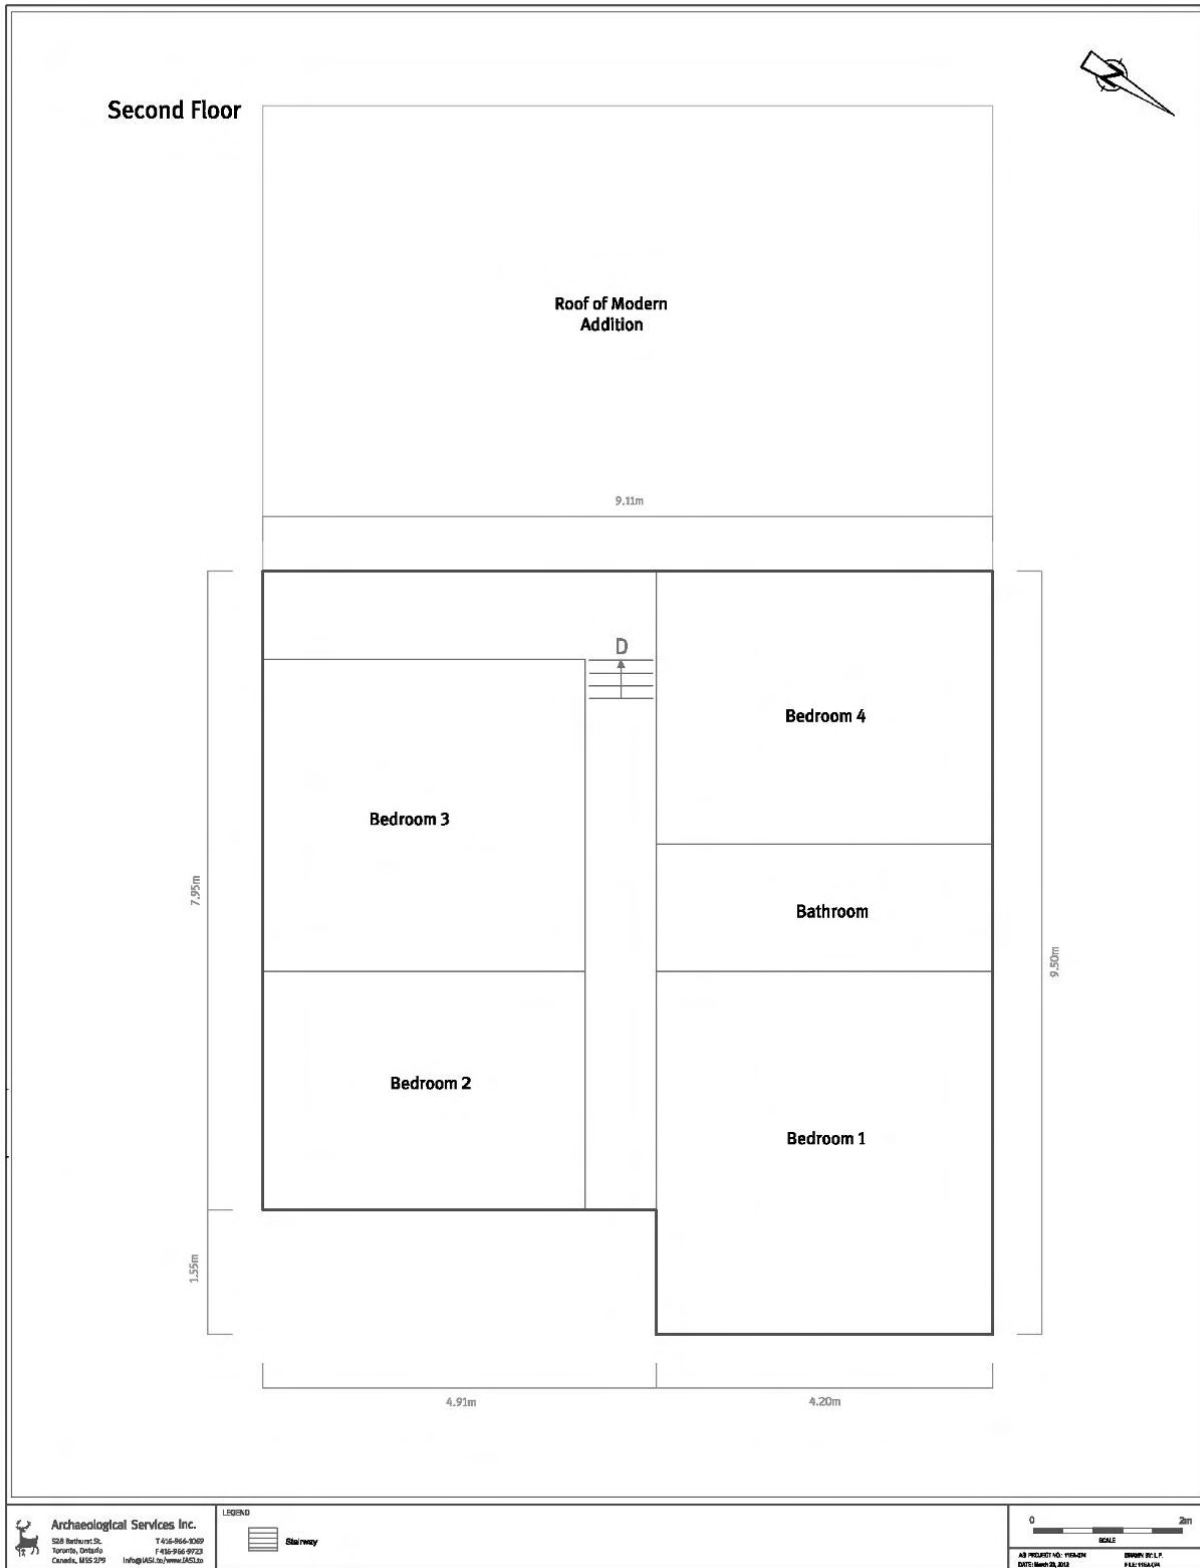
Floor plan of the second floor of the farmhouse. Measurements are approximate.
